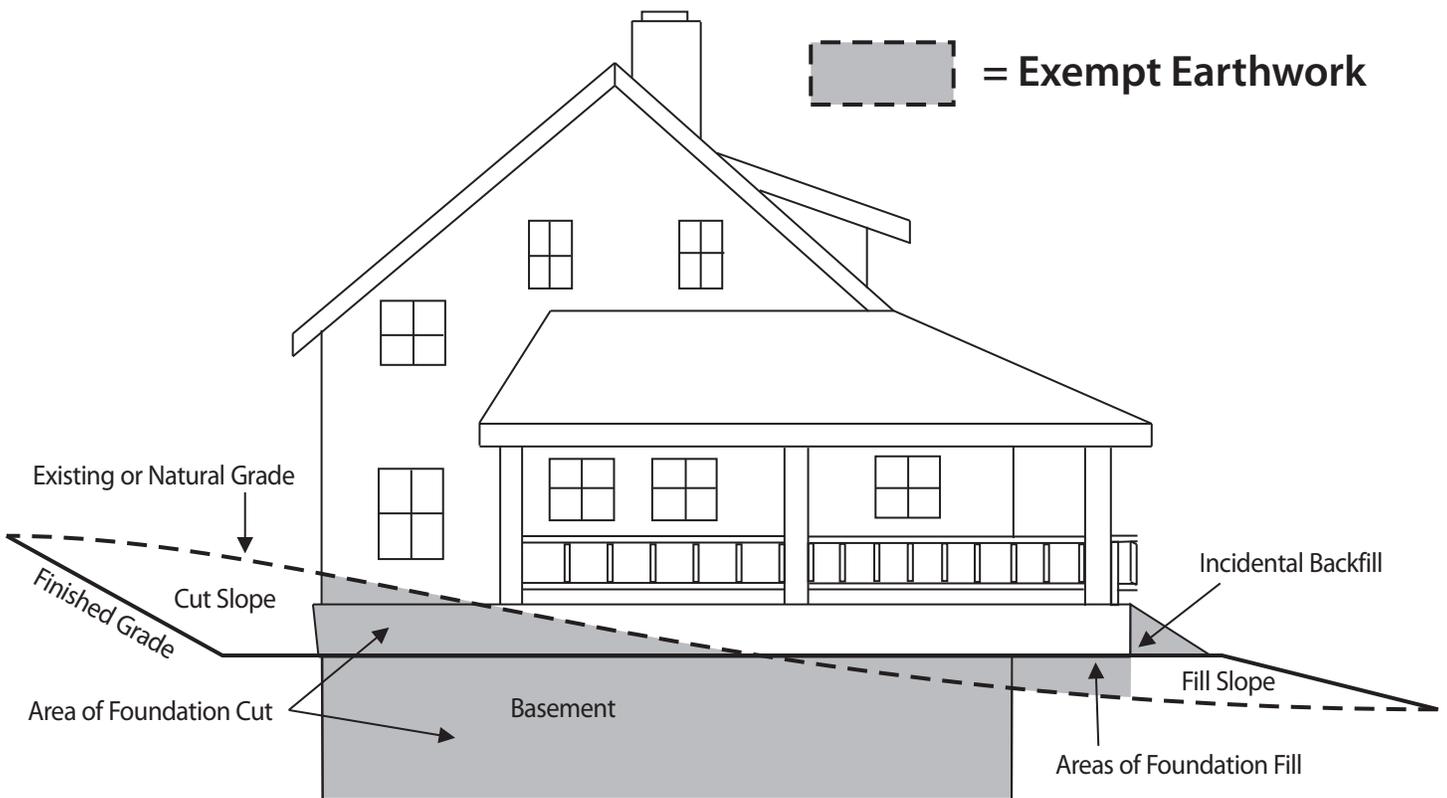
The diagram above illustrates which portions of a typical building pad are exempt.
